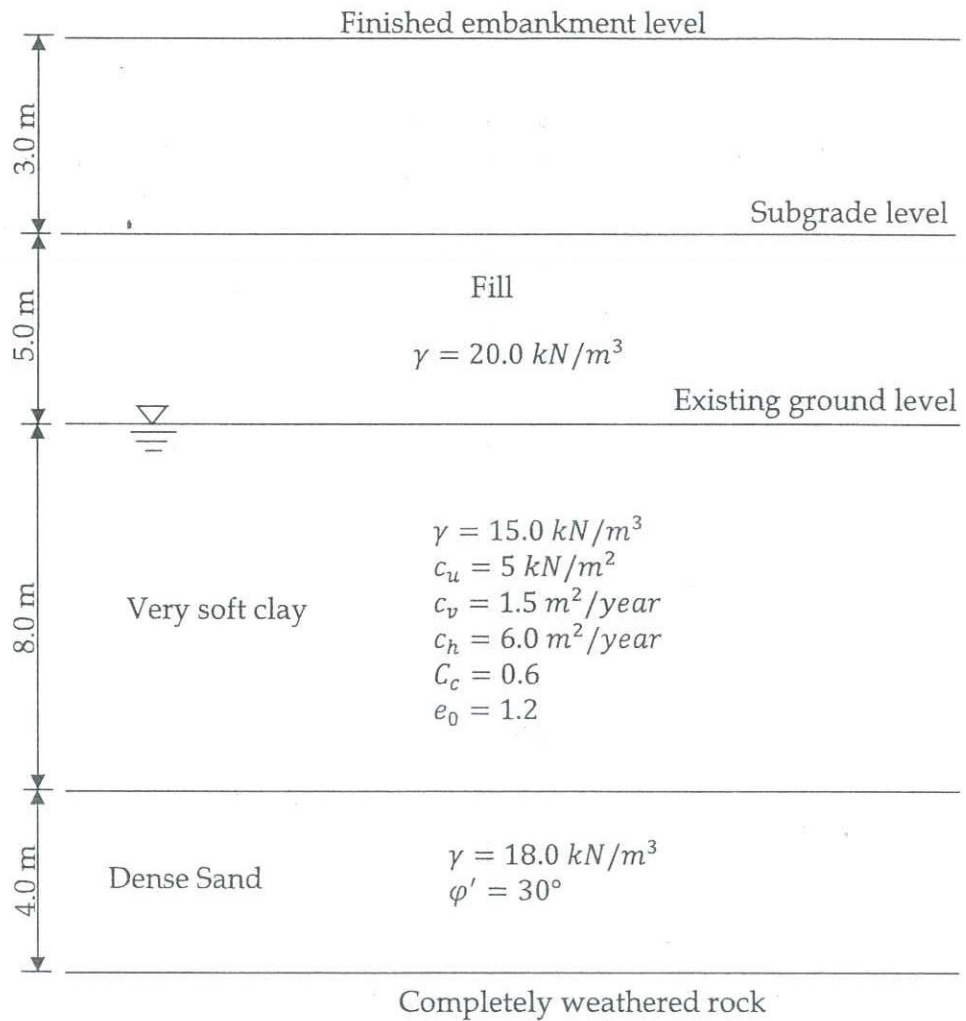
Cross section of the road embankment with sub surface soil profile
